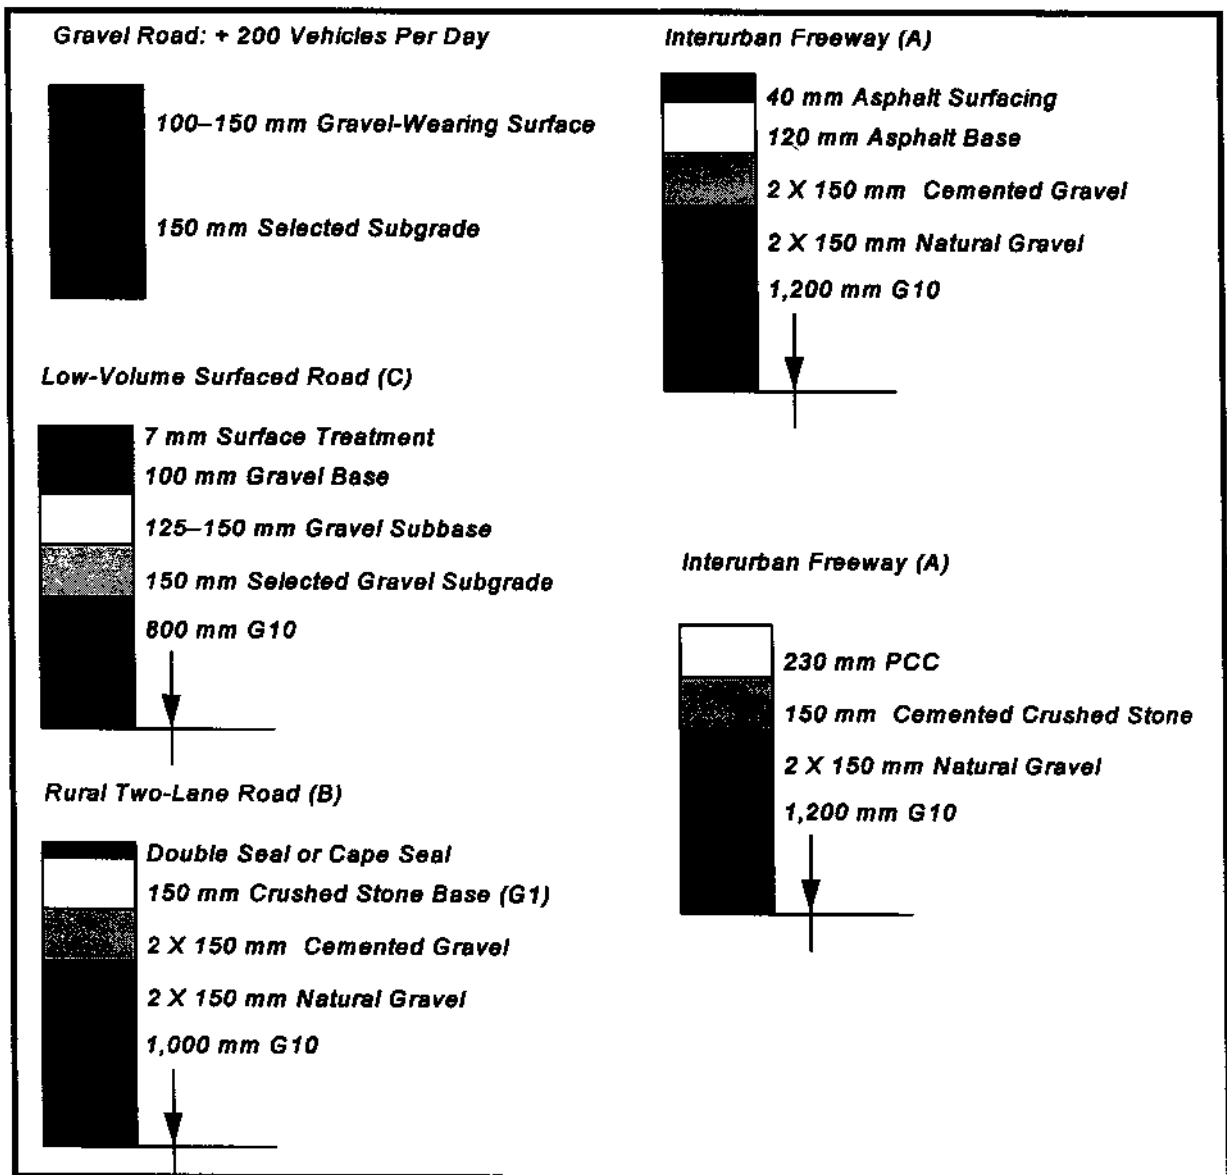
Typical Pavement Sections (A, B, and C refer to road categories.)
